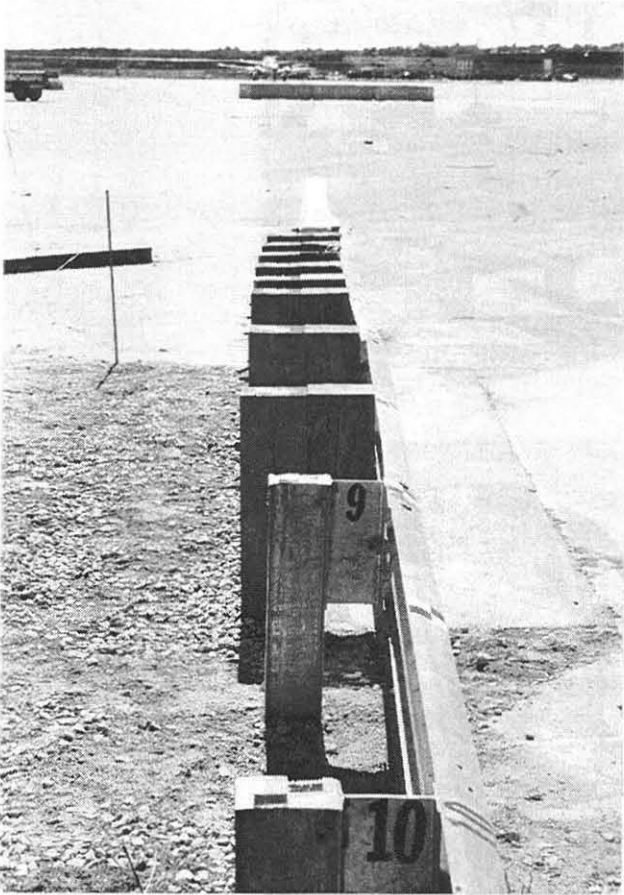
Barrier Damage, Test ITNJ-4 (Design No. 4)
